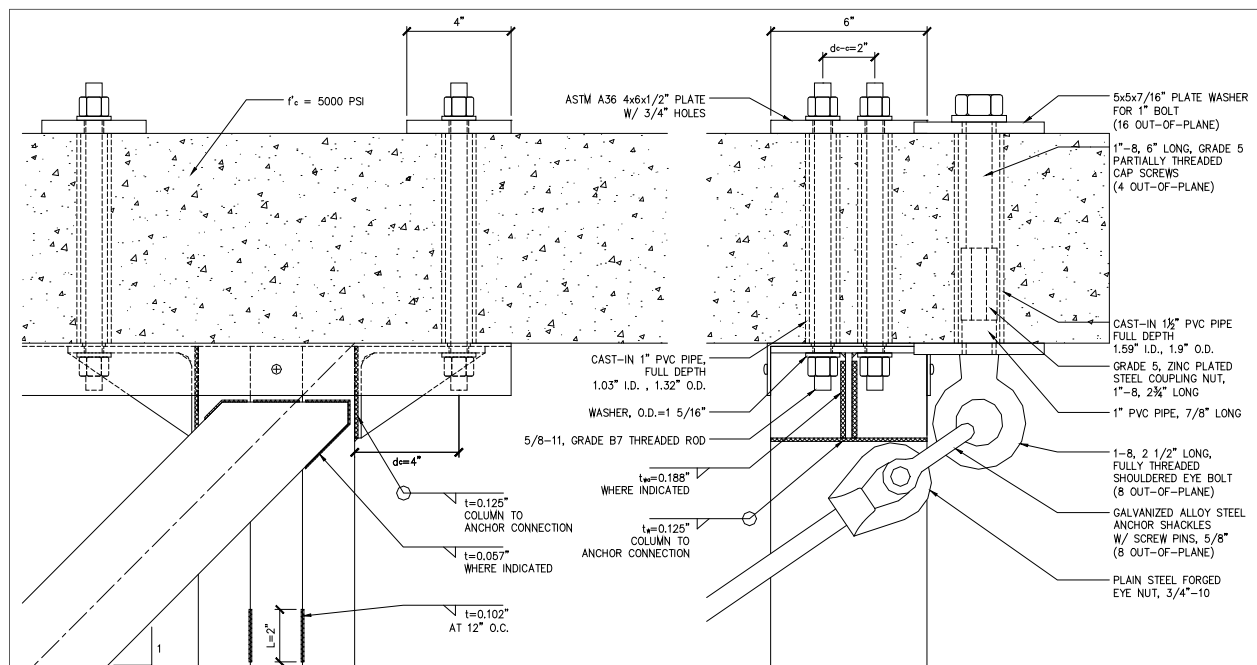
In-plane and out-of-plane connections and anchorage details at the first-story slab.
